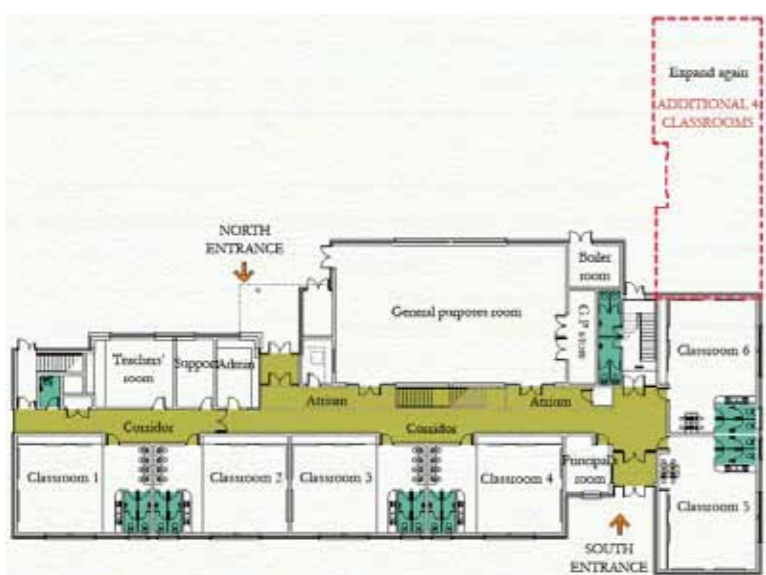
Ground floor plan of 12-classroom GRD school showing ease of expansion.
